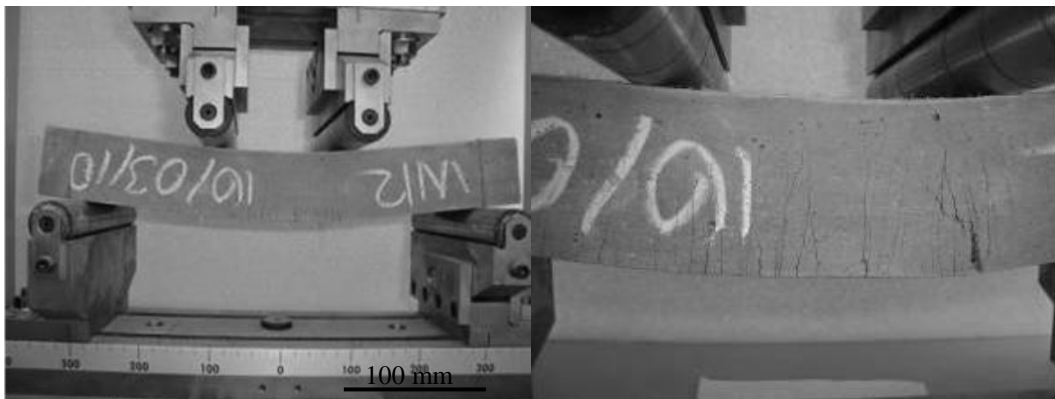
Typical cracking patterns of ECC beam specimen after flexural loading
